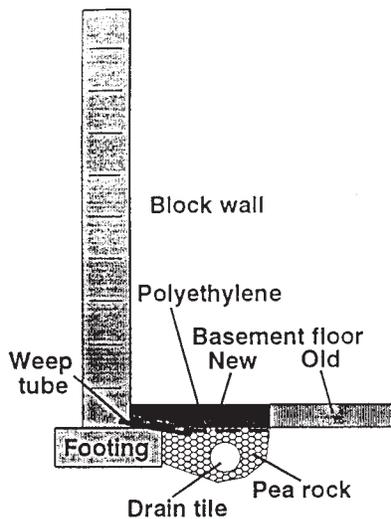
Cross section of basement wall and floor when retrofitting from the inside of the basement.
